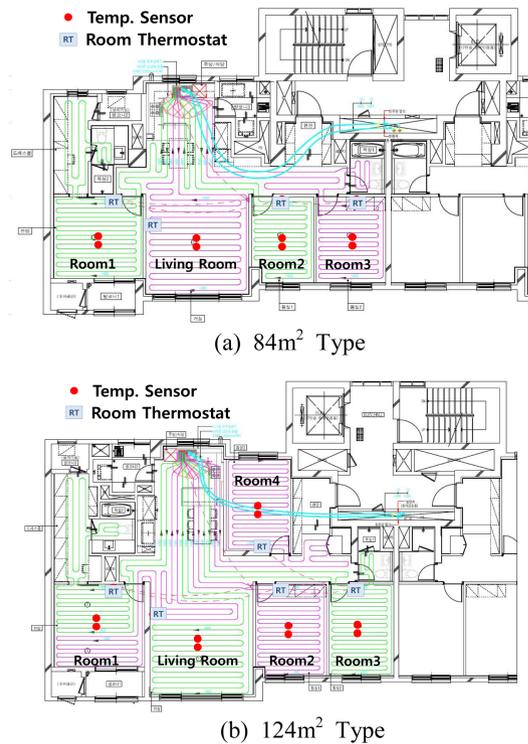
Plan and Layout of the Heating Coil of the Surveyed Houses
